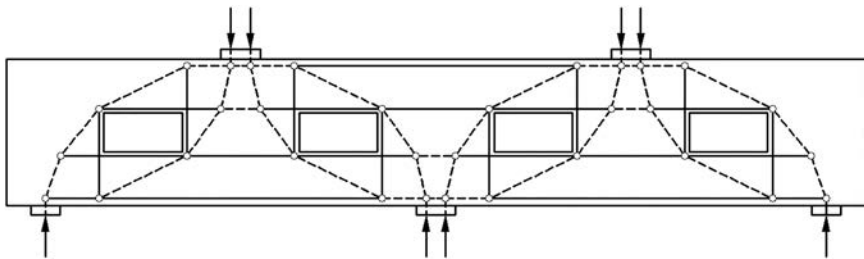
Example on modeling of continuous deep beam with large openings utilizing orthogonal web reinforcement around the openings.
